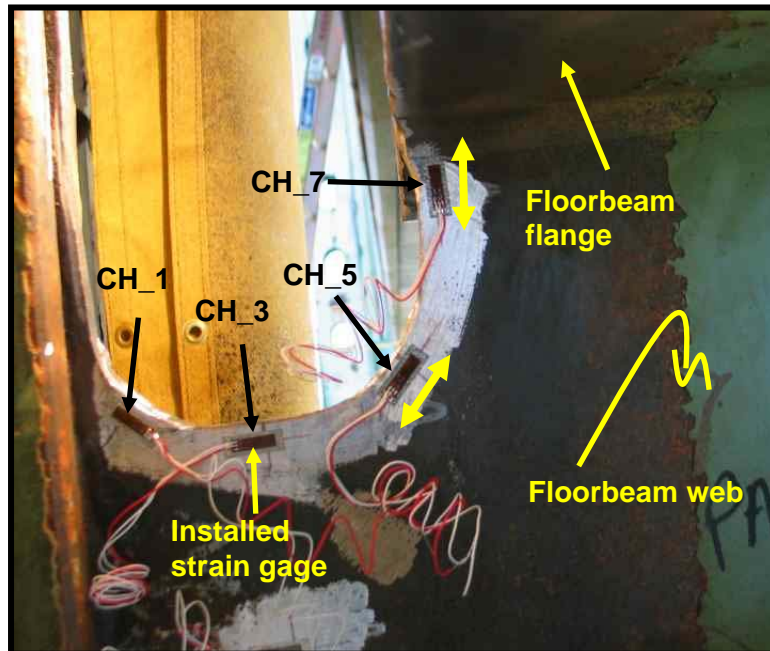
Strain gages installed on the web around the cutout on the web of floorbeam FB77 (View looking north)
